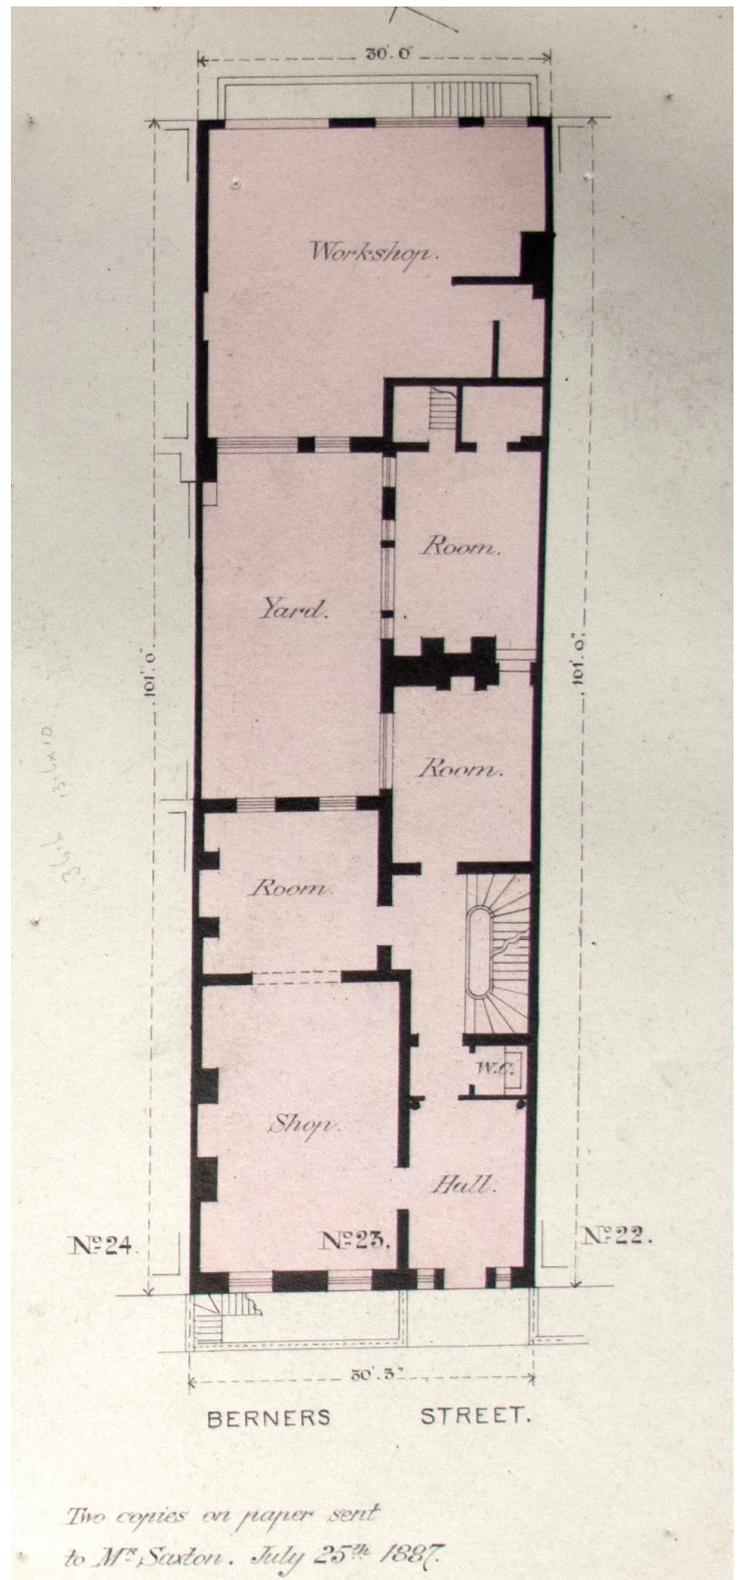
Ground-floor plan (1887), used with the kind permission of The Survey of London.
